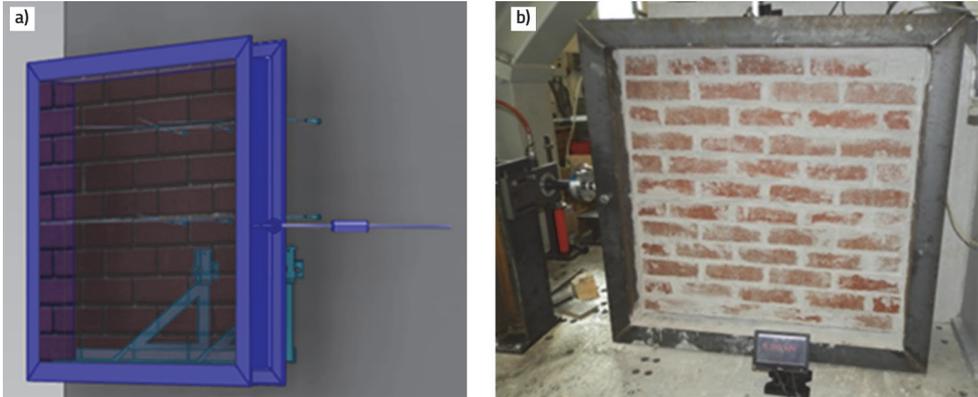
a) 3D model of a meso-scale test setup; b) Photo of exemplary test setup
